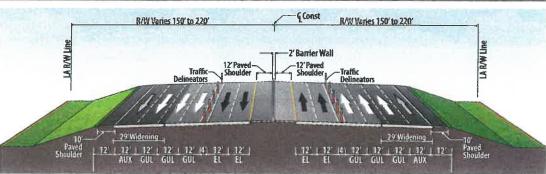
Segment C - Gandy Boulevard to north of 4th Street North Typical Sections
